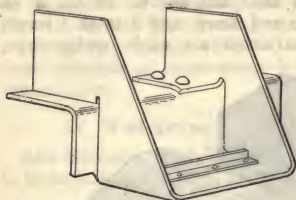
Duplex Wall-hanger for Large Wooden Girder
